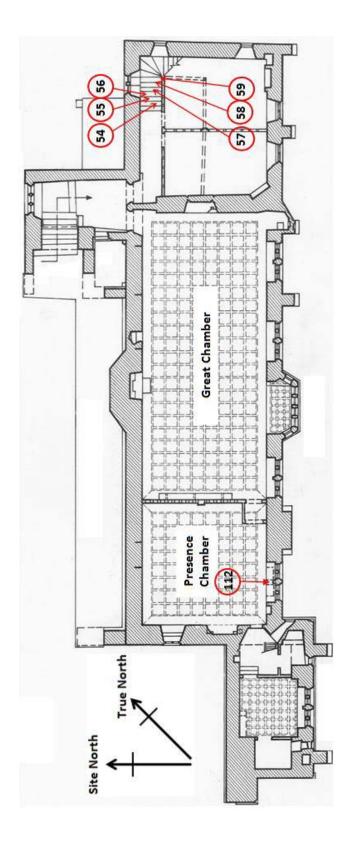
Plan to locate stair tread samples (after HBMC 1986)
